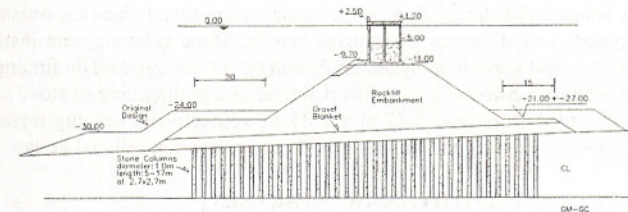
Typical Breakwater Cross Section According to Alternative Design
